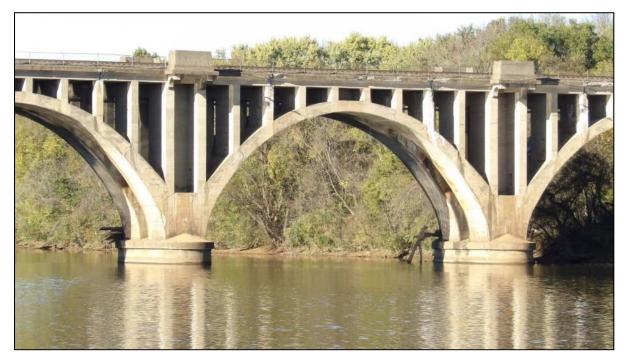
SPANDREL DETAIL, LOOKING NORTHWEST
